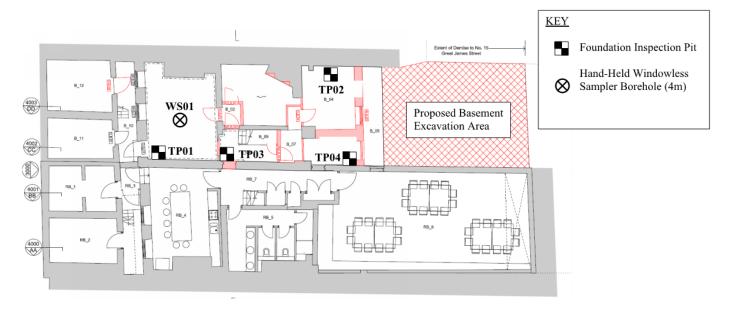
Site-specific ground investigation - plan of intrusive works - existing basement level.
